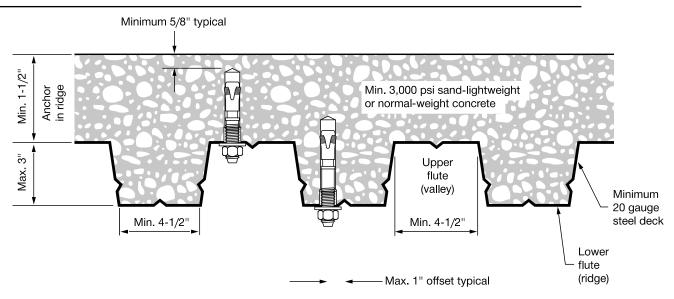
Installation of KWIK Bolt TZ in the soffit of concrete over metal deck floor and roof assemblies - W Deck
